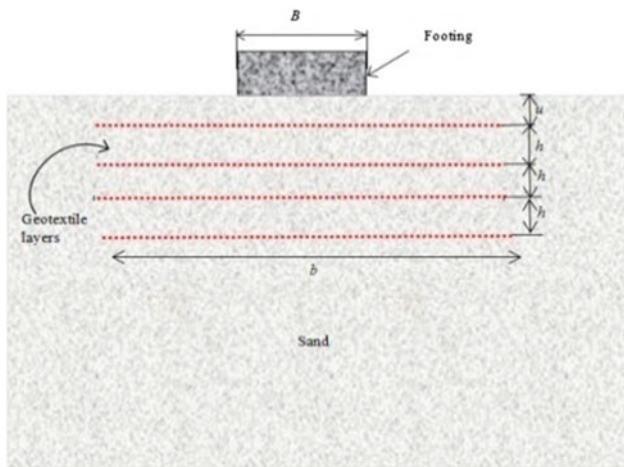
Geometry of the planar reinforced foundation bed as reported in the past studies
